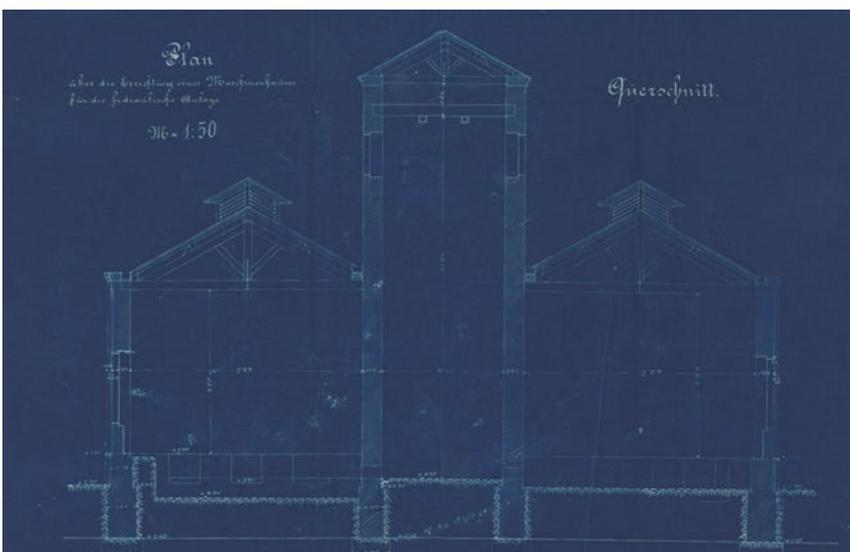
Engine room for hydraulic plant, 1884, transverse section [11]
